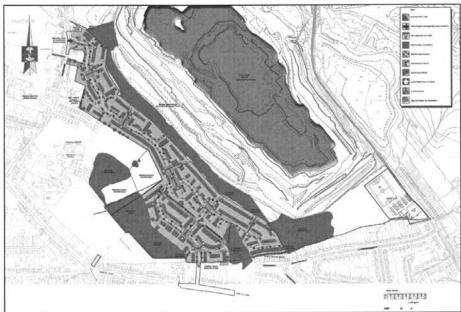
Extent of planning application surrounding the South and West of Jees Quarry.
